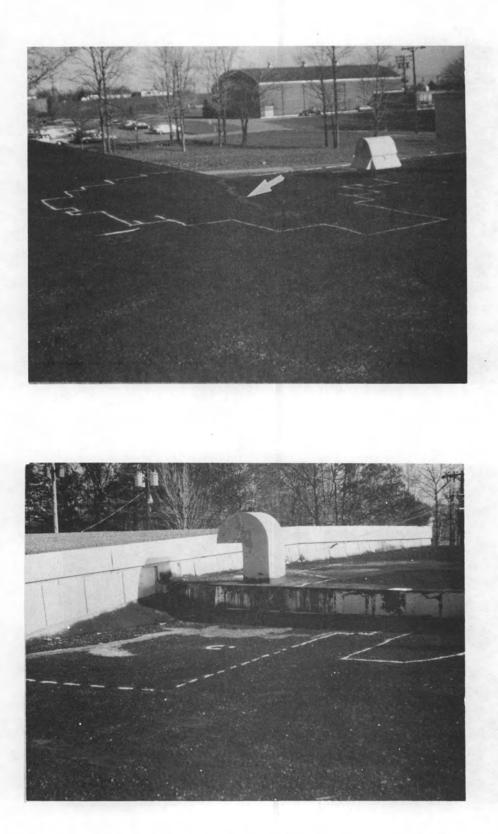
Wet areas on roof of Building 35 (arrow points to a split in the roof membrane).
